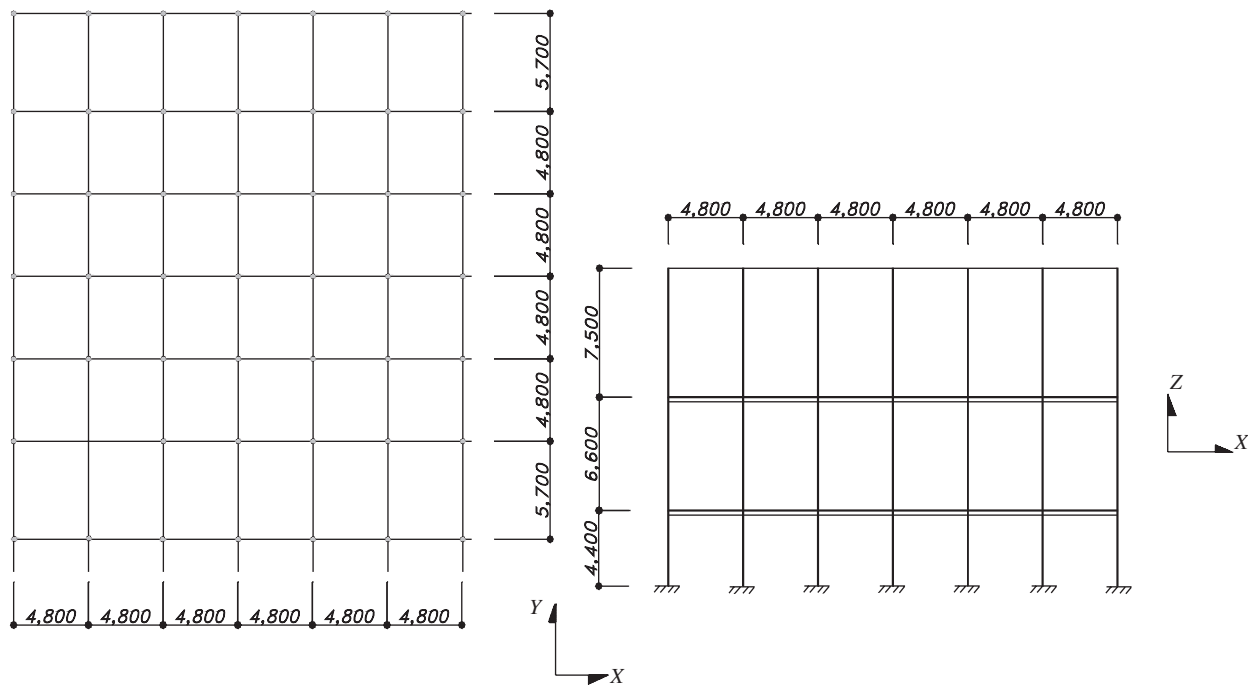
Plane and elevation view of the high-tech building (unit: mm).
